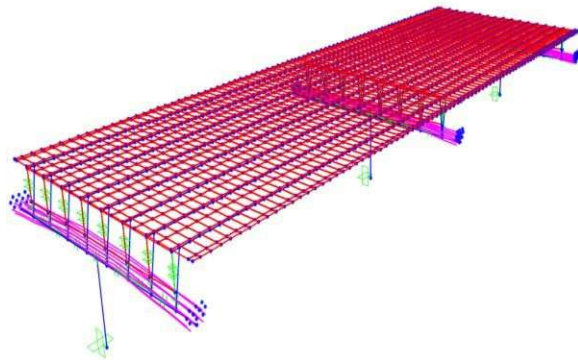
Model 2-Continuous Bridge Model to review the Effect of Prestress on Deck Deformation and Bearing
